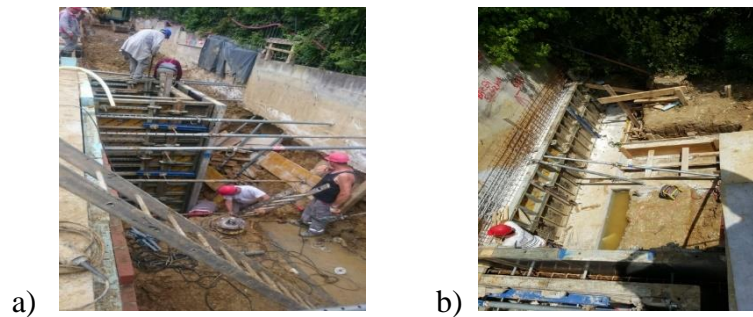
a) providing existing walls of the fall, b) concreting of the foundation of existing walls
